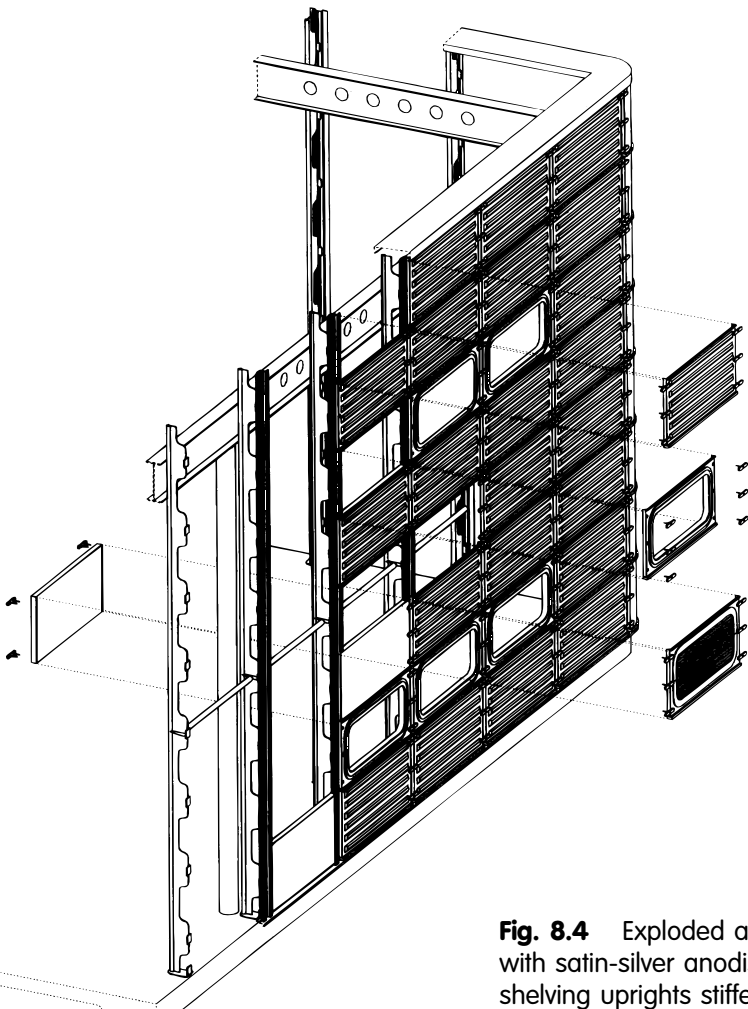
Exploded axonometric of the construction. Cladding panels are located with satin-silver anodised aluminium clamps fixed to mullions made from standard shelving uprights stiffened with flat steel plates.
